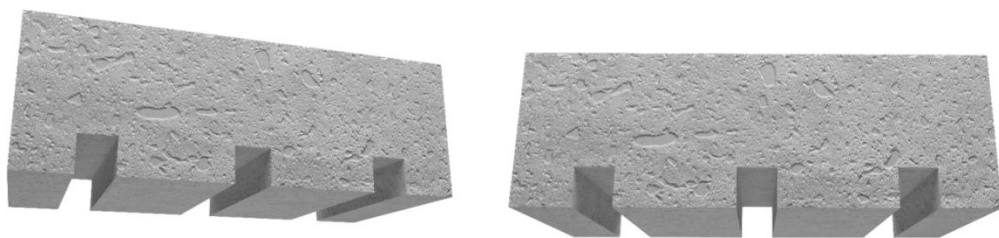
View of paver block with 20mm x 20mm drainage slot design (Author)
